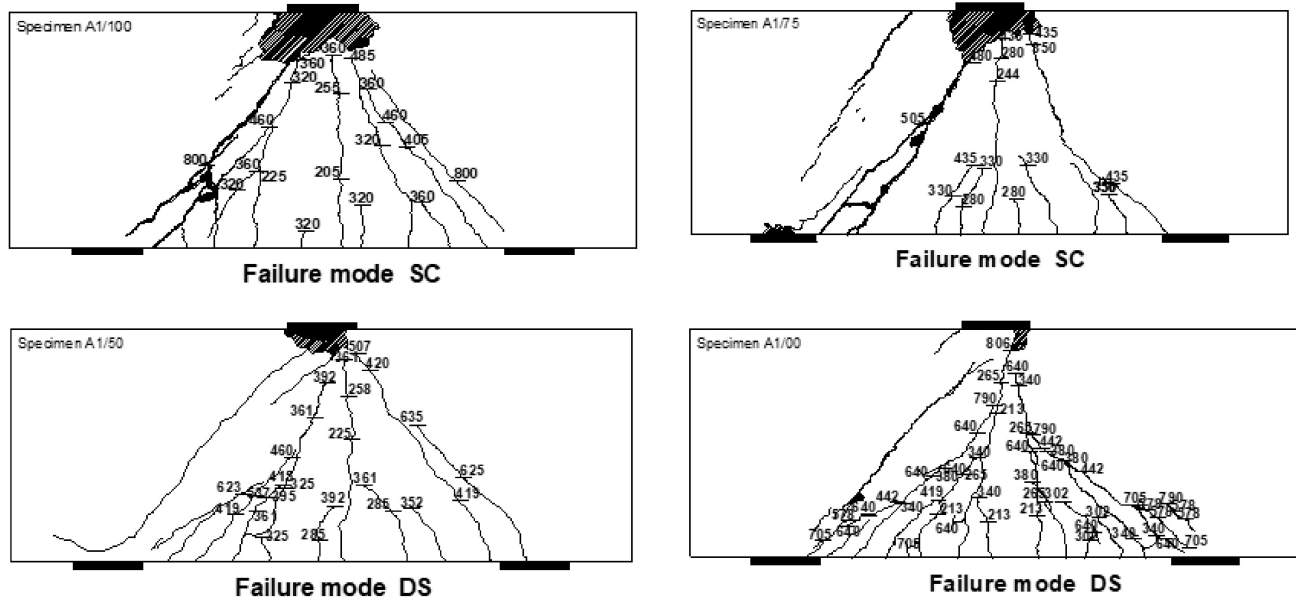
Crack patterns observed in the tested specimens (CS = crushing of strut failure. DS = diagonal splitting failure).
